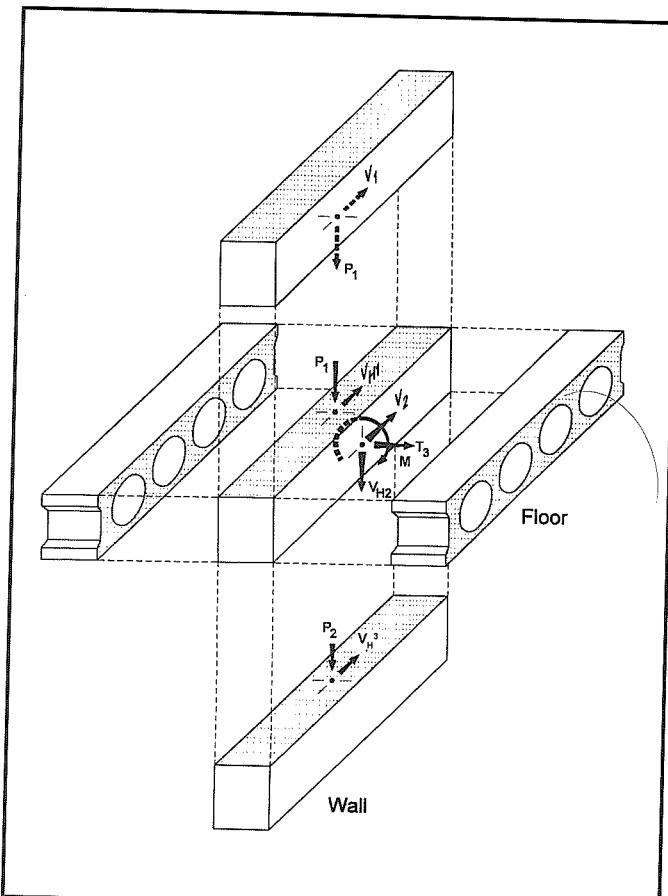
Exploded View Of An Interior Floor To Wall Connection And The Various Connection Forces (references 5 and 9)
